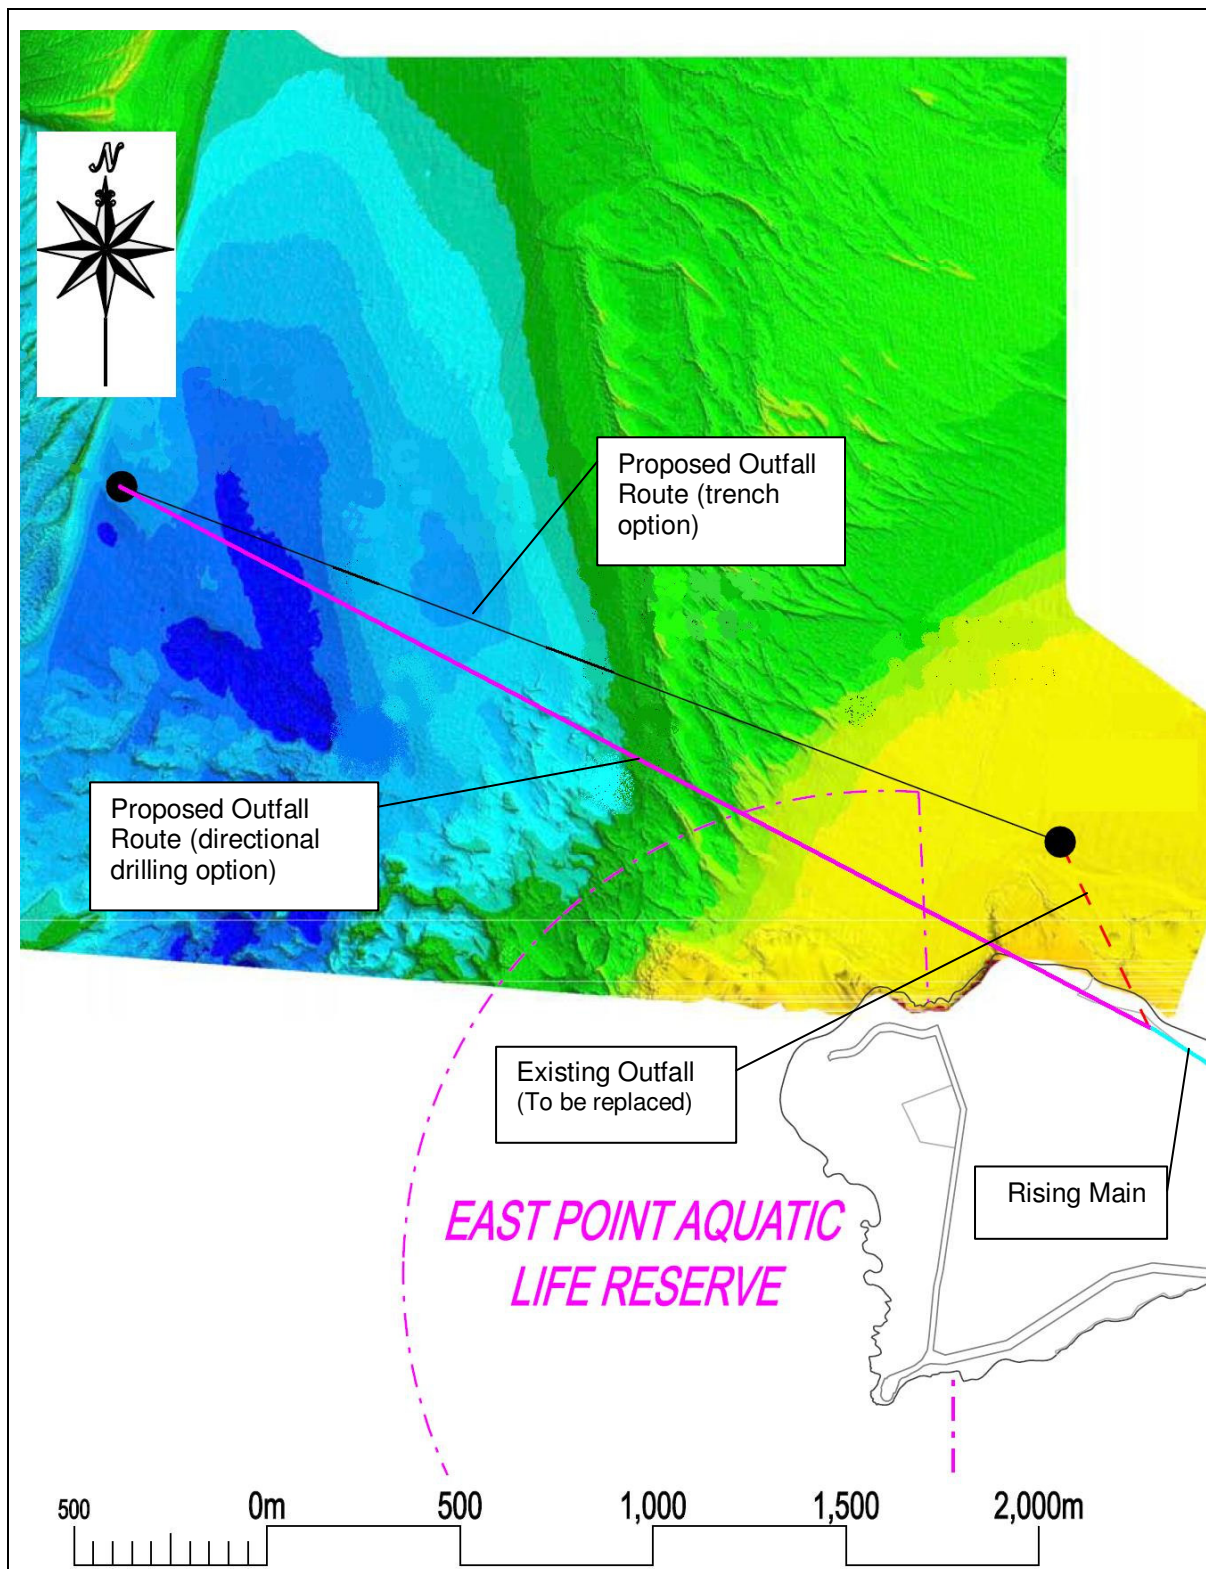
Proposed site layout for EPO (trench and directional drilling options shown)
